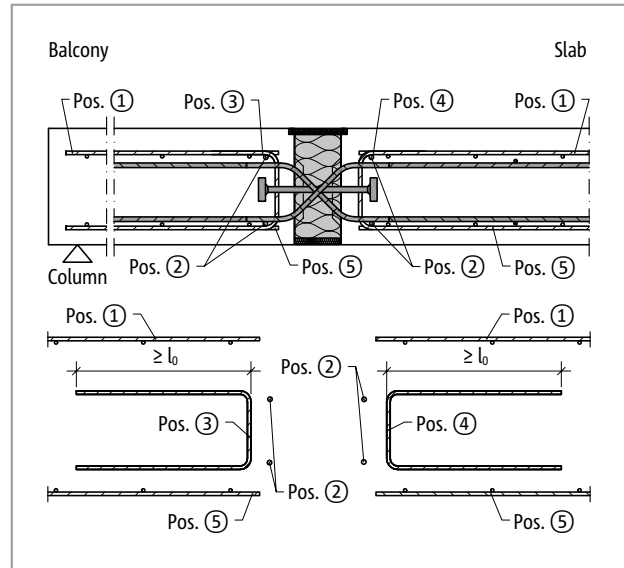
Schöck Isokorb® T type Q-P-VV: On-site reinforcement
